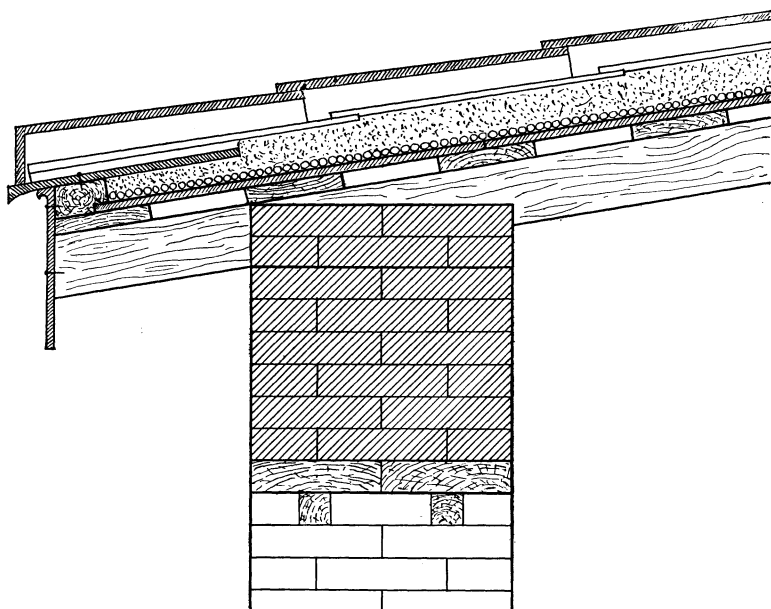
SECTION SHOWING ROOF CONSTRUCTION.
